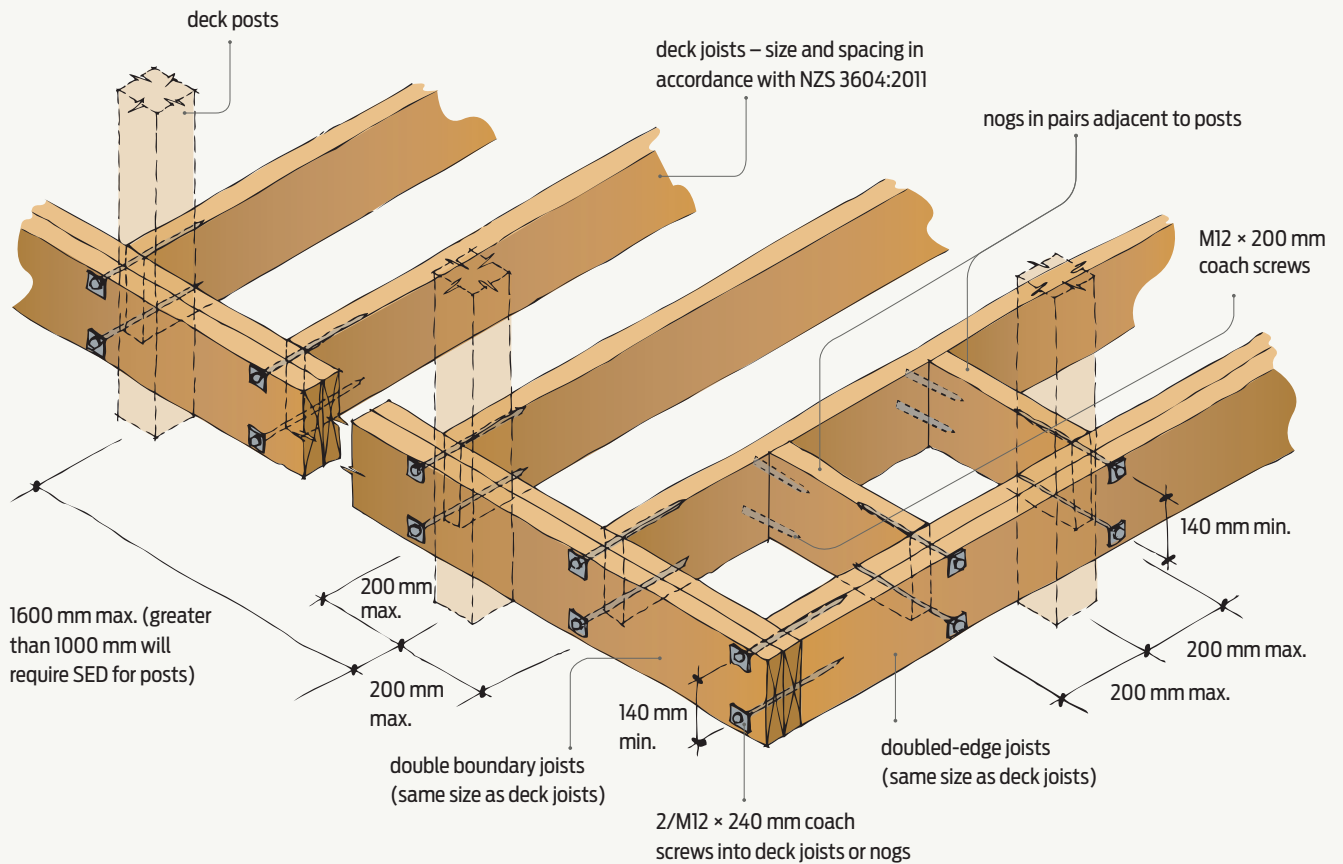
Alternative solution for deck support for cantilevered face-fixed post support detail.
